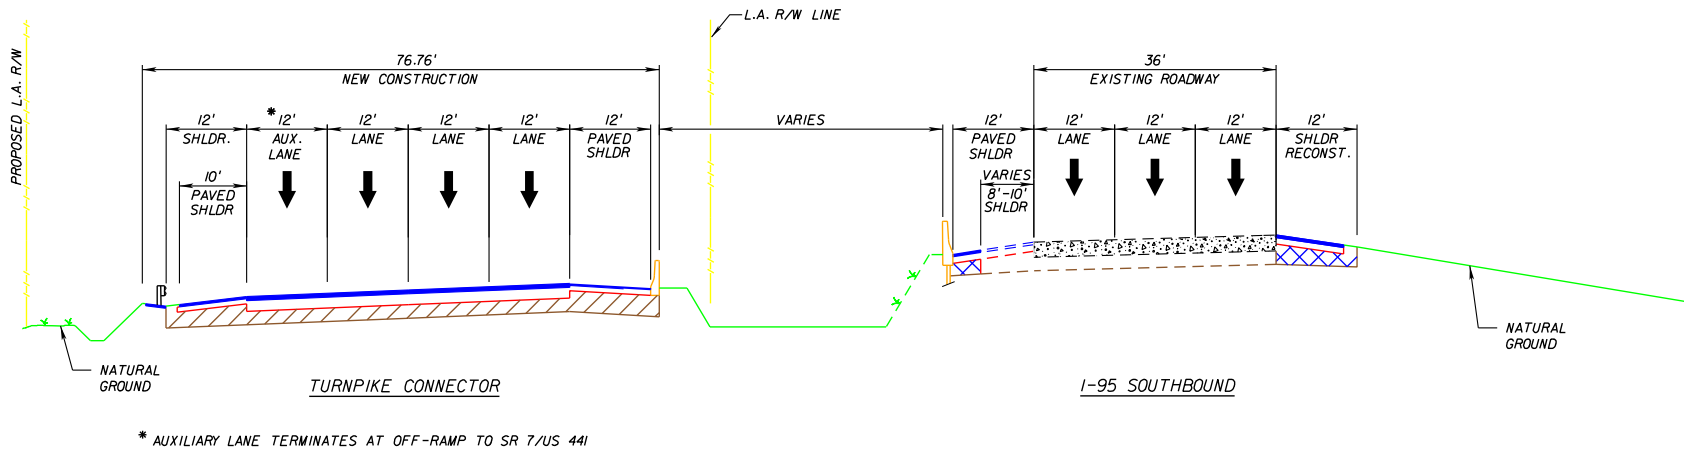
Proposed Typical Section – I-95 SB N. of Biscayne Canal – Alt. 3B
